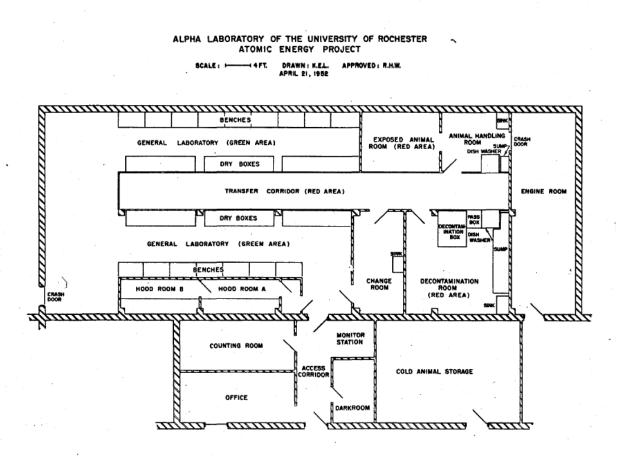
University of Rochester AEP Alpha Lab Floor Plan
